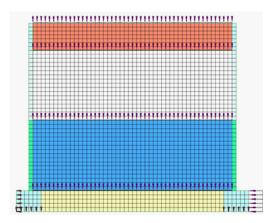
Model of the bearing masonry party wall, variant 3 (by author)
